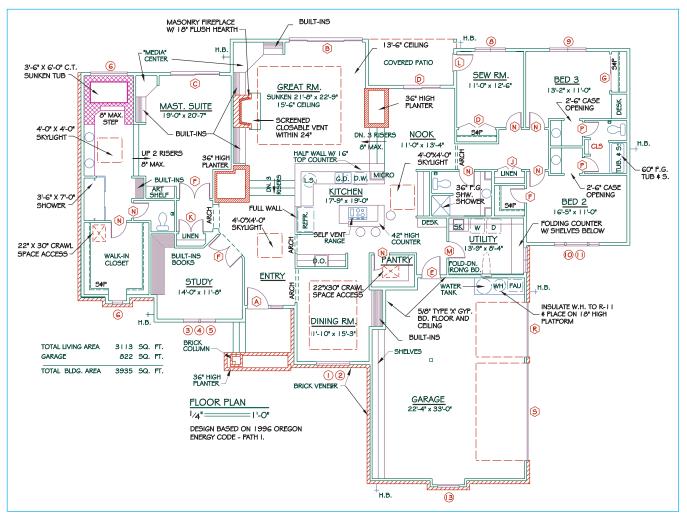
A The preliminary floor plan is used to form the base of the finished floor plan. Text to describe all interior materials must be provided.
